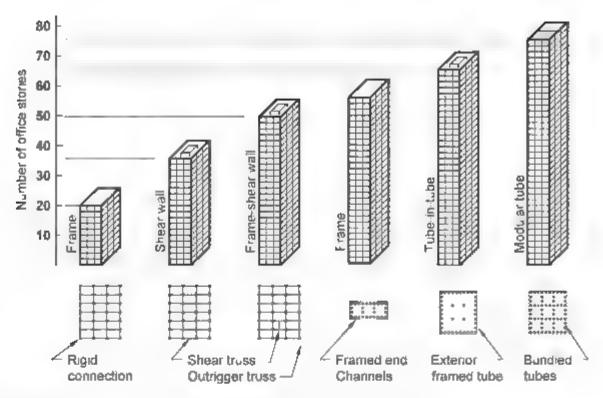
Structural systems and optimum height limitations (Ali and Moon 2007)
